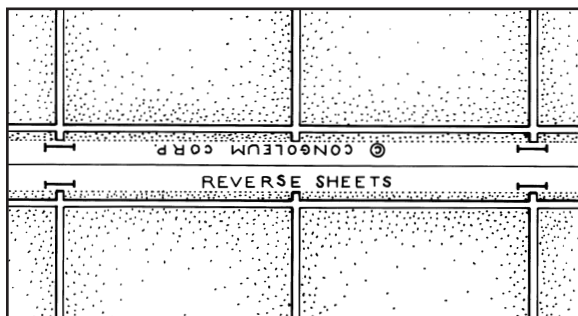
Align C to C or I to I for design match points on Reverse Sheets designs.
